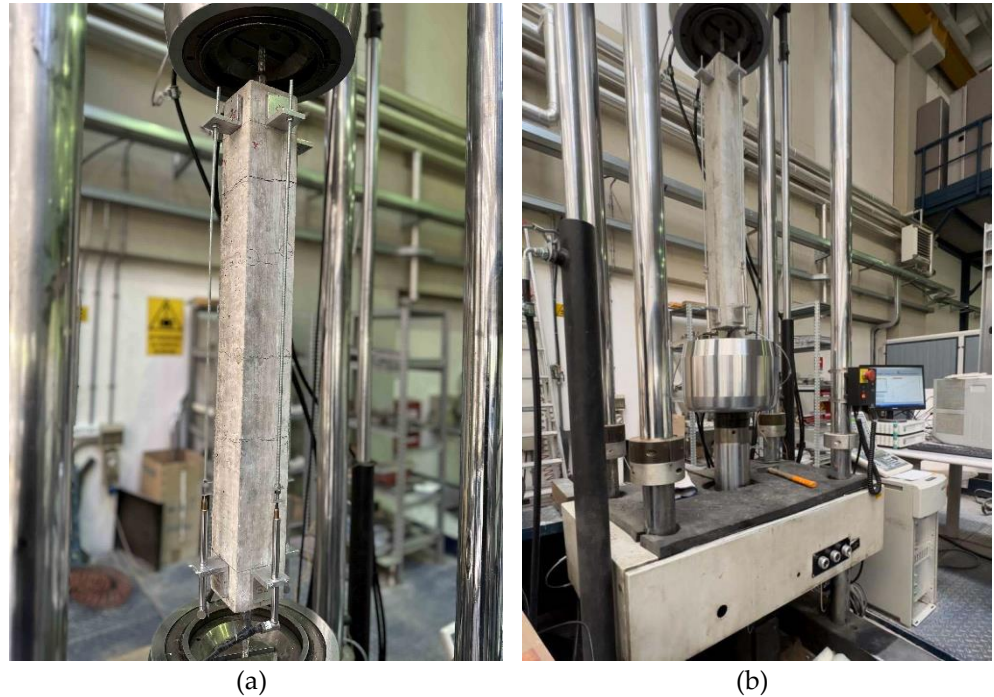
Tension tie in Instron machine; a) After pre cracking; b) before pre cracking.
